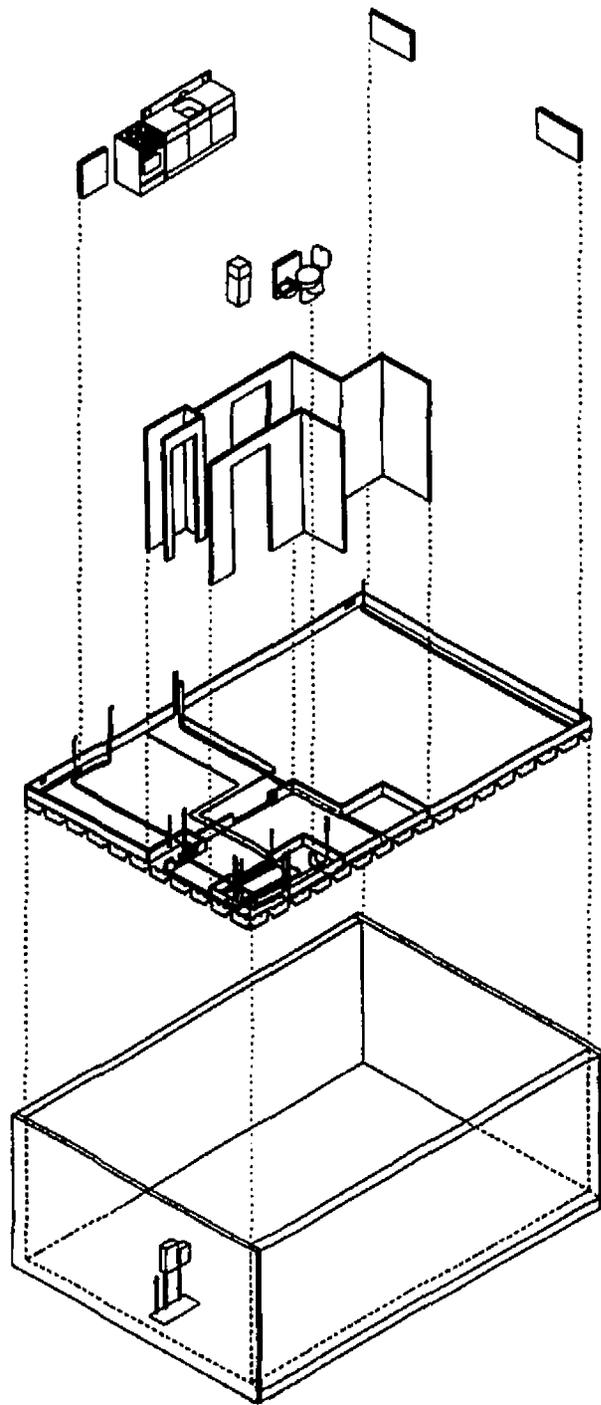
A Diagram of a Dwelling Organized on the Concept of Base Building/Fit-out
